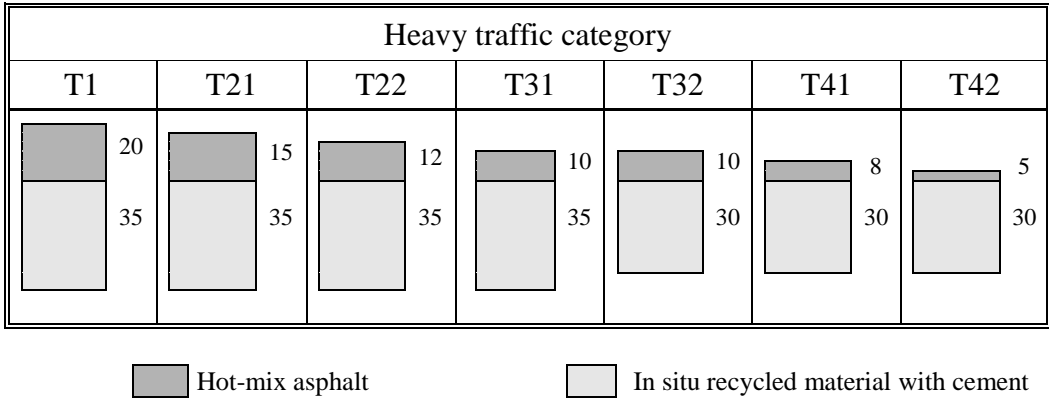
In situ recycled pavement with cement sections laid on low quality subgrade
